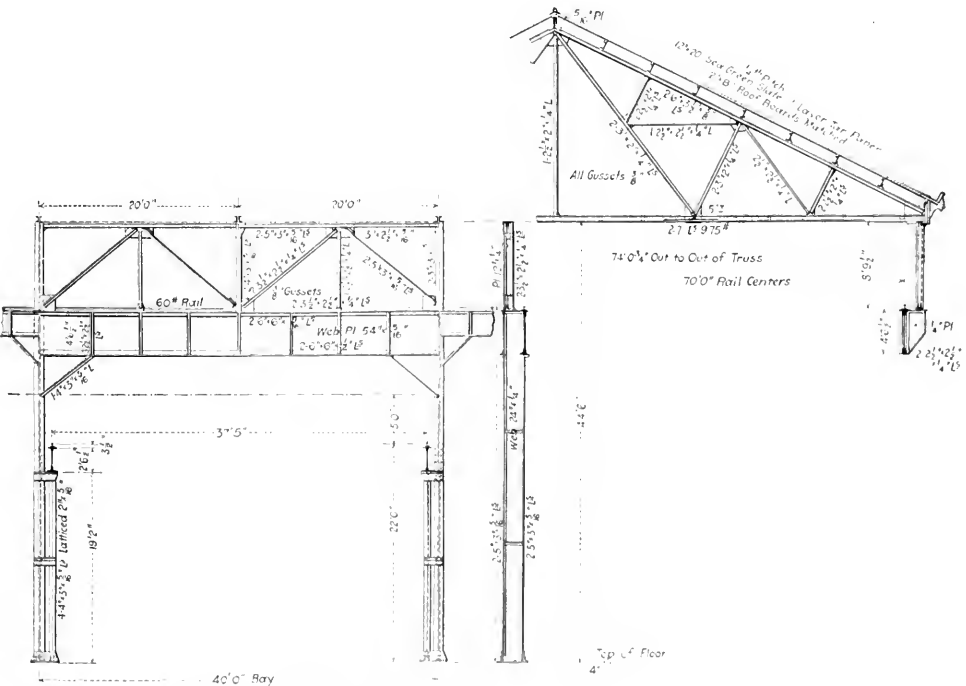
Details of Roof of New Storage Building and of Erecting Shop.
